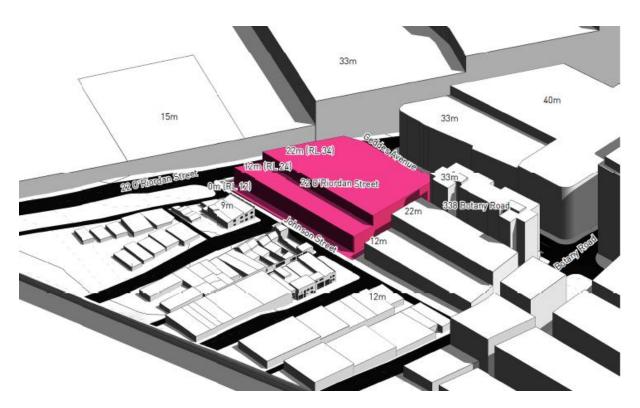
Isometric view of proposed building envelope - looking north-west along Johnson Street
